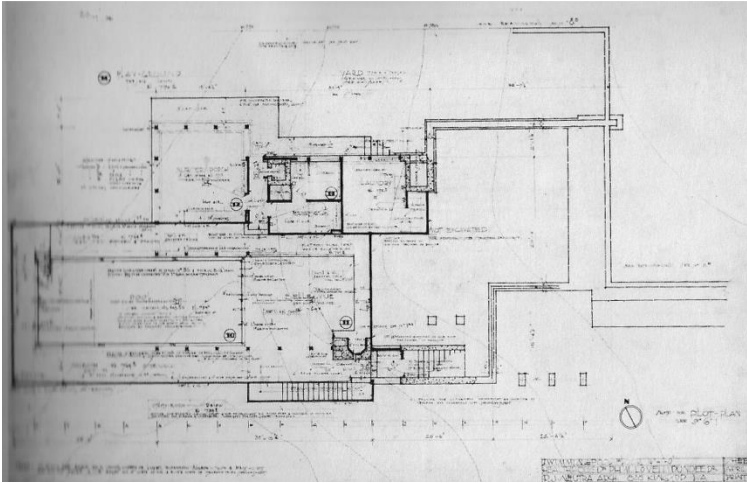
Lovell Health House. Bottom floor plan. (Hines, *Richard Neutra*, 83.)
